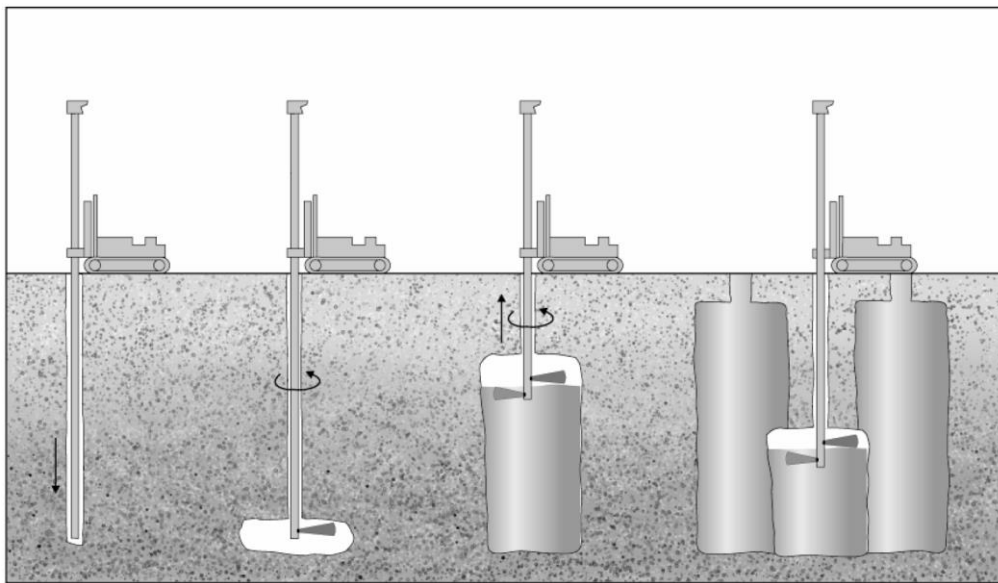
Example of construction of vertical jet grout columns from Burke (2004).
